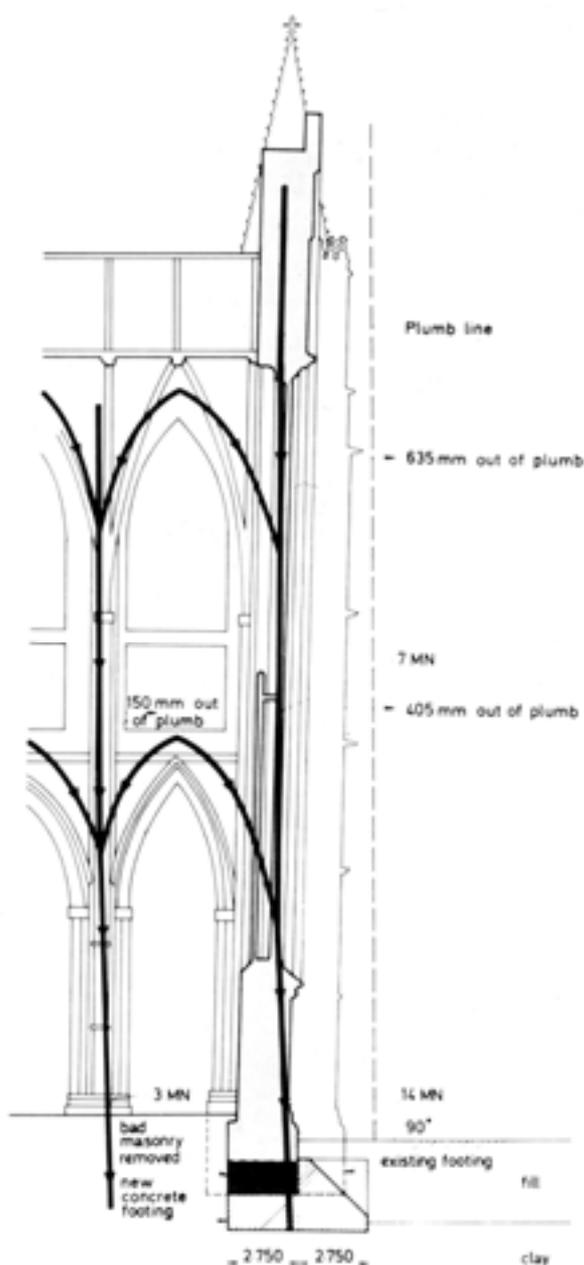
Diagram of thrusts and movements, east end, York Minster, England. The diagram shows the line of thrust dangerously close to the outside face of the wall and indicates eccentric loading on the foundations. New reinforced concrete foundations were designed to give concentric loading. Diagram from Feilden (1982), after Ove Arup & Partners.
